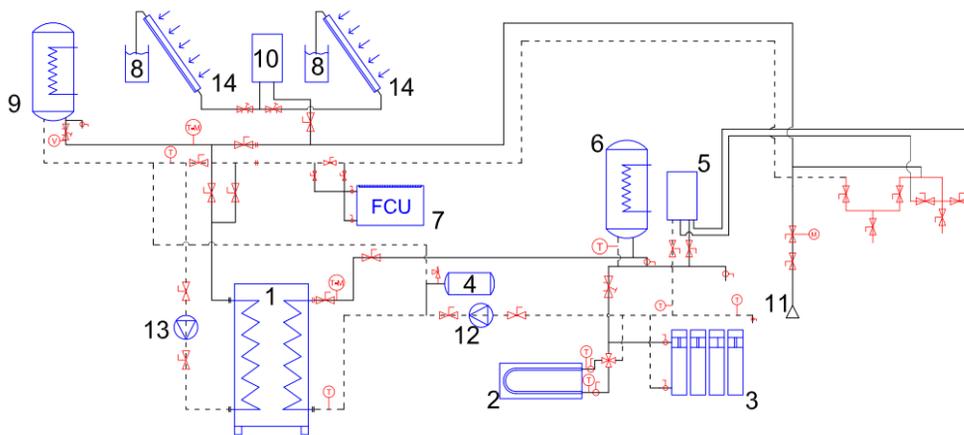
Hydraulic schema of existing installation of heat pump and solar collectors
